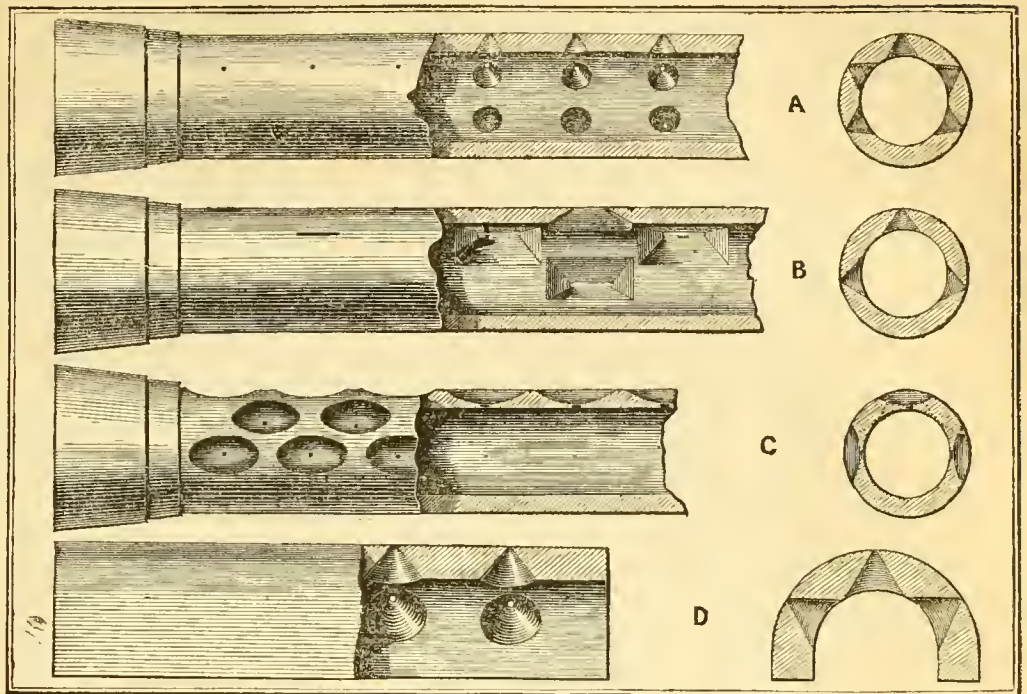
A, B, C, Sketches of the Pipes. D, a Drain Pipe.
